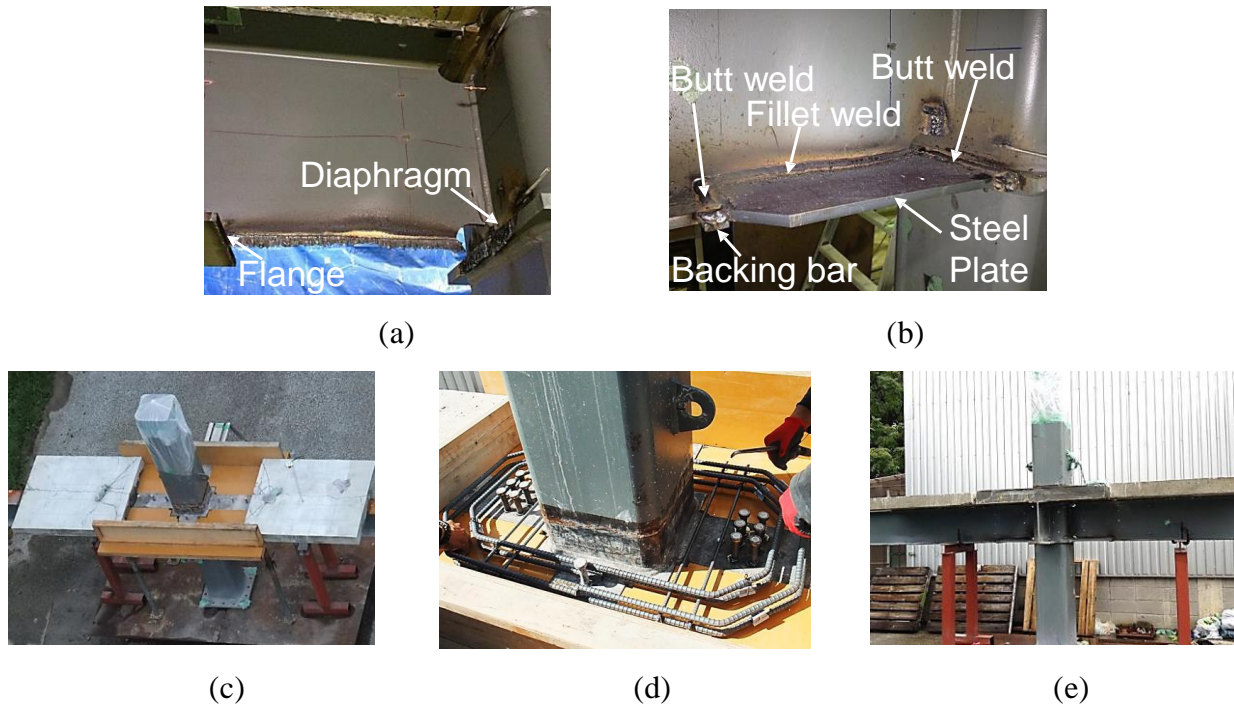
Repairing procedure: (a) Removal of damaged bottom flange by flame cut; (b) Replacement of steel plate by welding; (c) Removal of severely damaged slab portion; (d) Placing steel reinforcement and welding headed stud; (e) SFRCC slab cast
